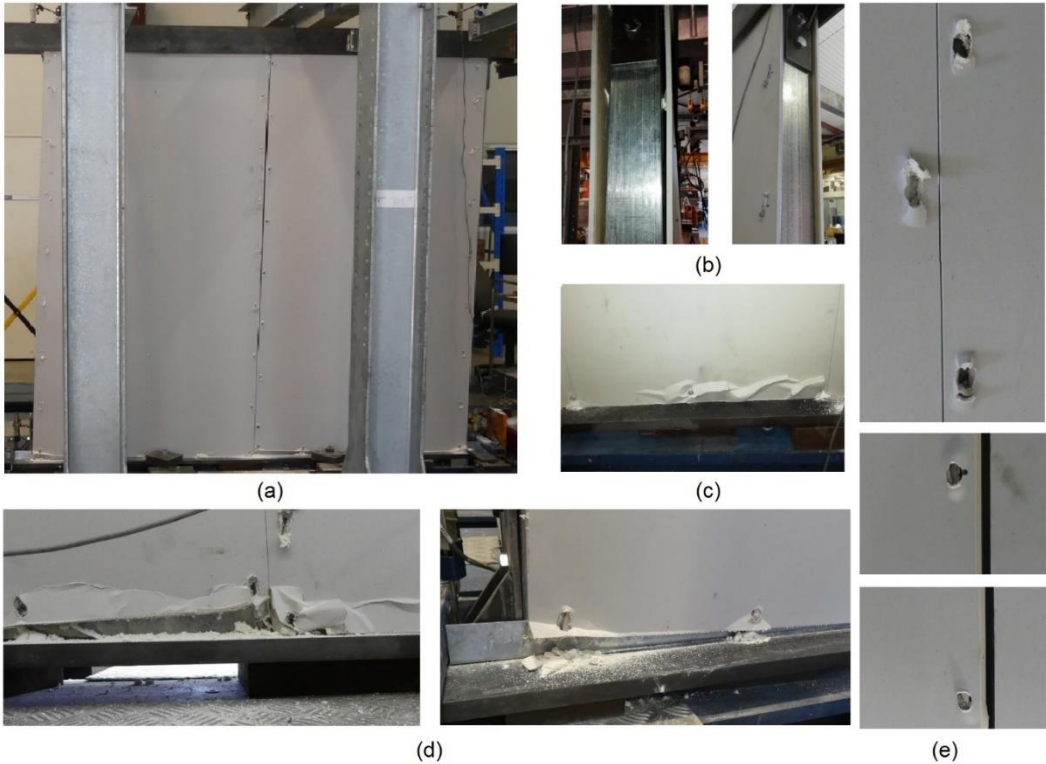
Failure modes of the specimen HW-C4: a) Overall deformation of GWB board, b) detachment of the GWB from the frame, c) bearing failure of GWB, d) Tear-out sheathing failure and GWB crashing, e) Pull-through of the screw
